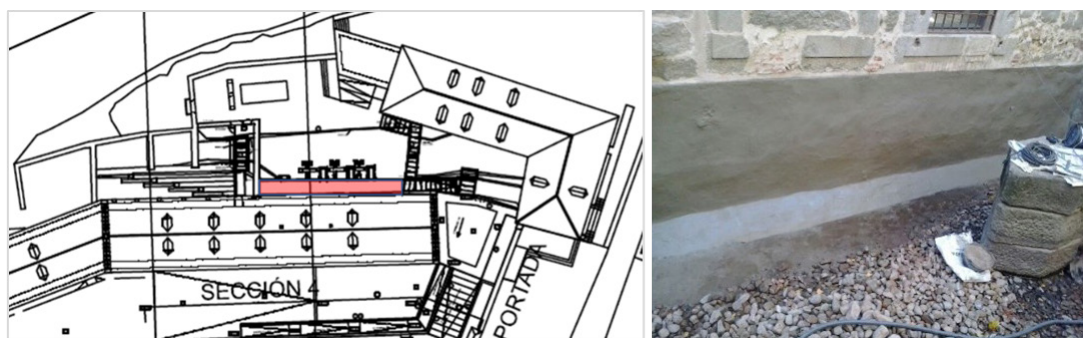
Floor plan showing the location of the channel to be waterproofed and a detail of the channel.
